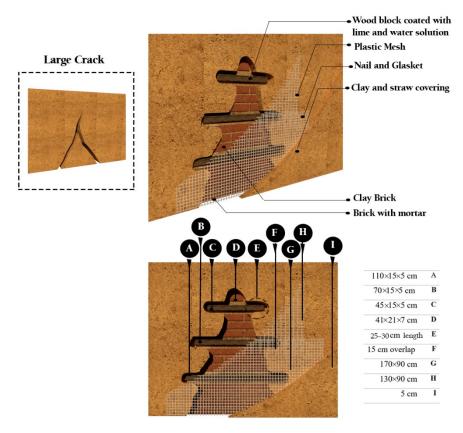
Example of architectural detail for conservation of a large crack in the wall (for instance, 80 cm width).
